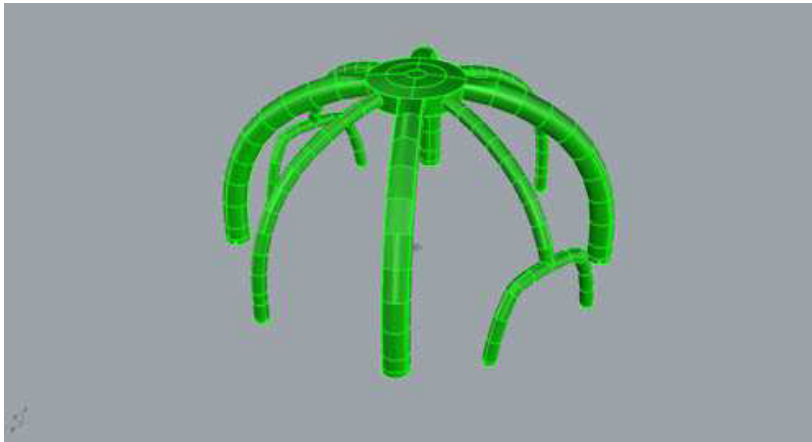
Typical Arrangement of Seal Tubes within a Dome Structure (Image by Barton Engineers)
